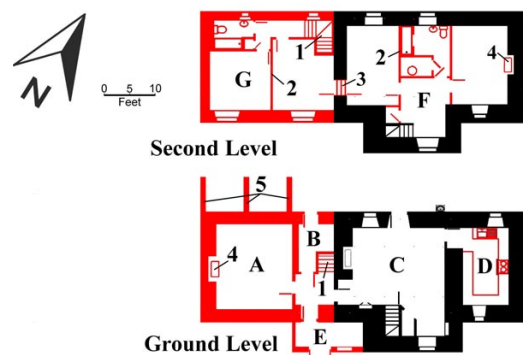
floor plan of the Notts residence after the first major renovation; shippon now a parlour (A); new stairwell (1); cross-passage (B) enclosed; kitchen developed (D); walls and floor framed with dimensional lumber (2) with lath and plaster finishing; second levels developed (F & G) stairway (3); fireplaces (4); stone buttresses (5).
